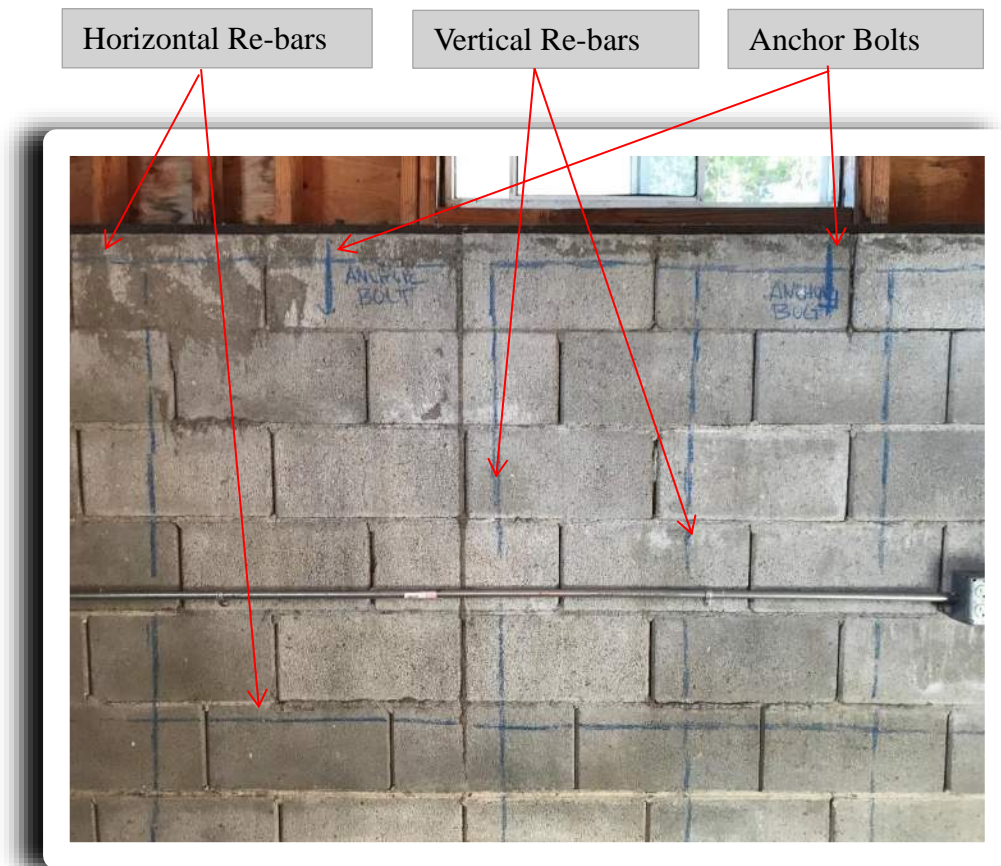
Digital Picture taken showing Horizontal and Vertical re-bars embedded in the CMU wall and Anchor bolts 4' on center.
